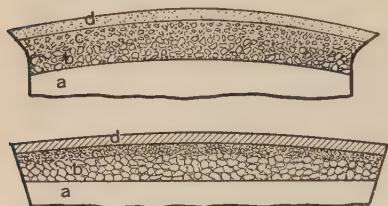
CROSS SECTION OF MACADAM (ABOVE) AND CONCRETE (BELOW) ROADS.
